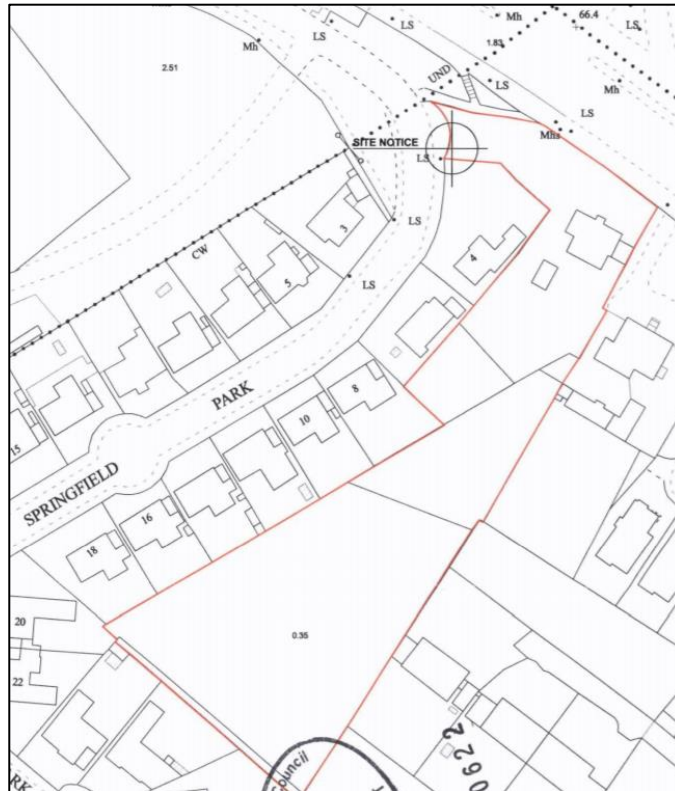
Proposed Site Layout Plan – Springfield Park © Dun Laoghaire-Rathdown County Council 2020
